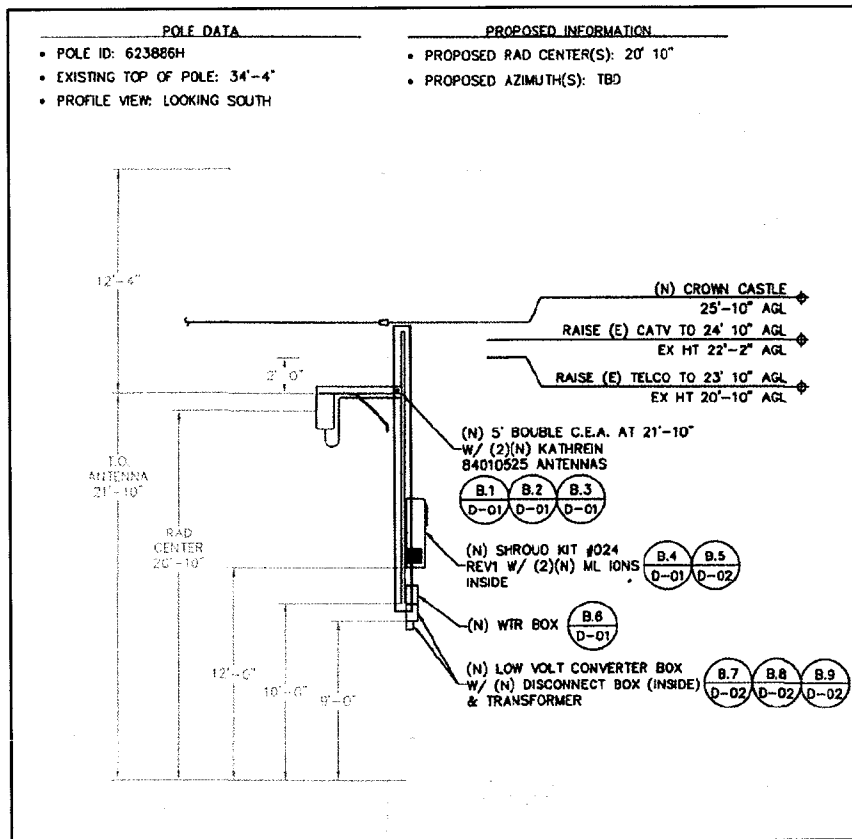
Proposed conduits not detailed. (Source: Plans C-02 Panel A.4; Annotated by Dr. J. Kramer).
